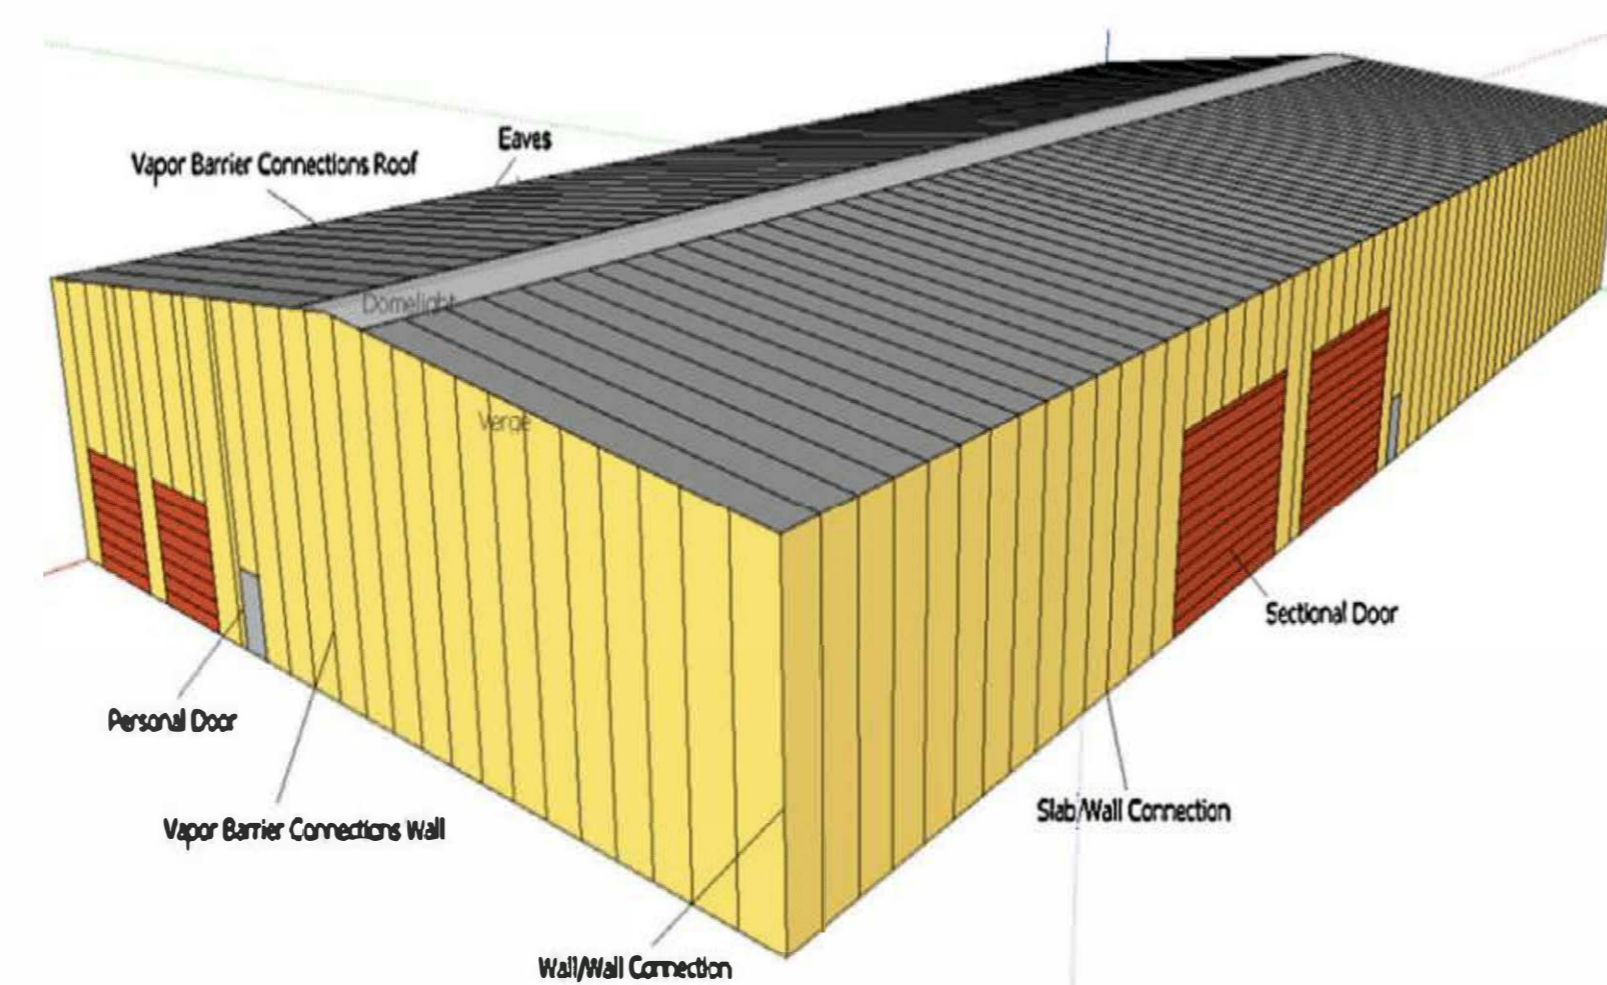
Relevant leakage of building component and connection of the sample building. (Adapted from 3)
